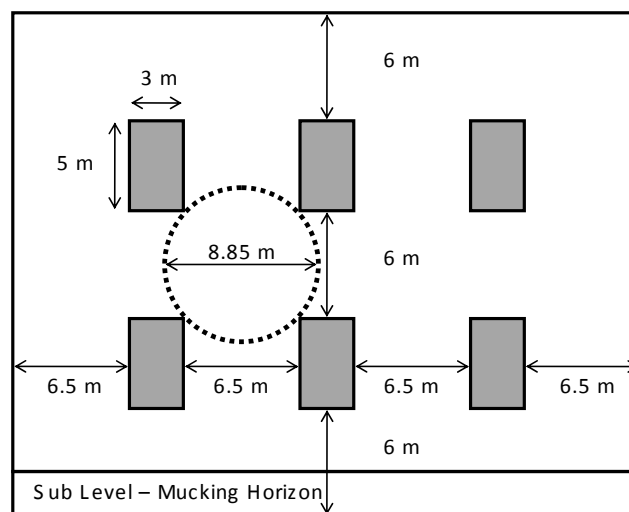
Proposed room and pillar stope configuration (plan view)
